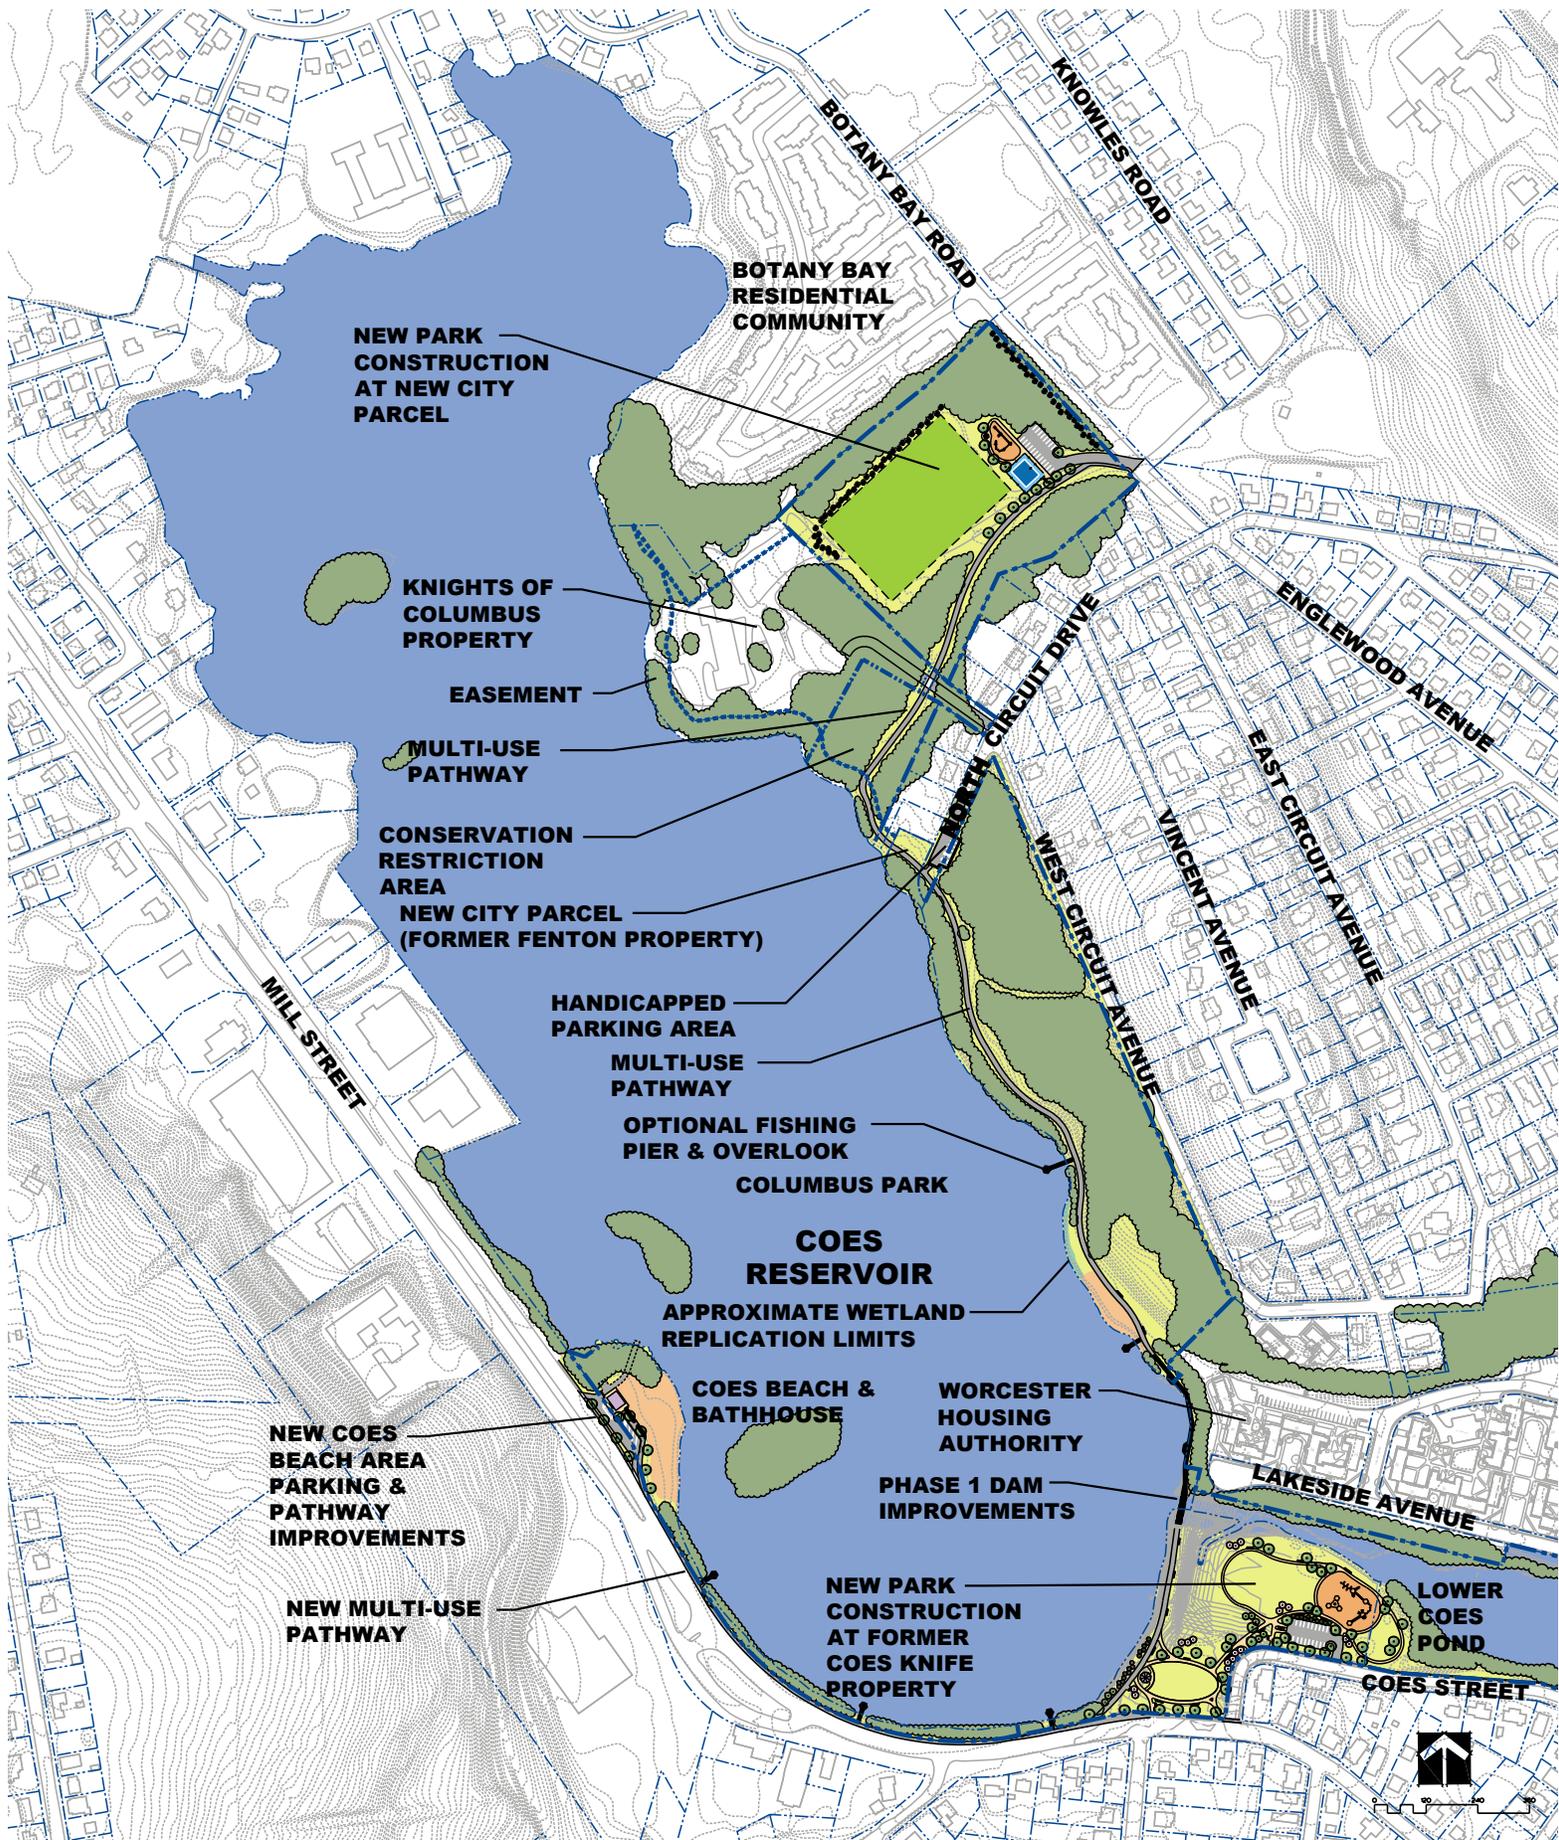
Master Plan - Public Open Space Properties Surrounding Coes Pond.
